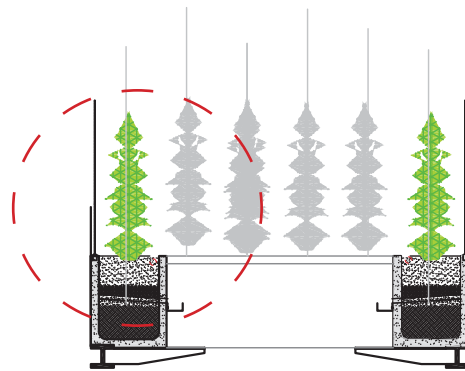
Section: Green platform(Author, 2008) Scale 1: 50
